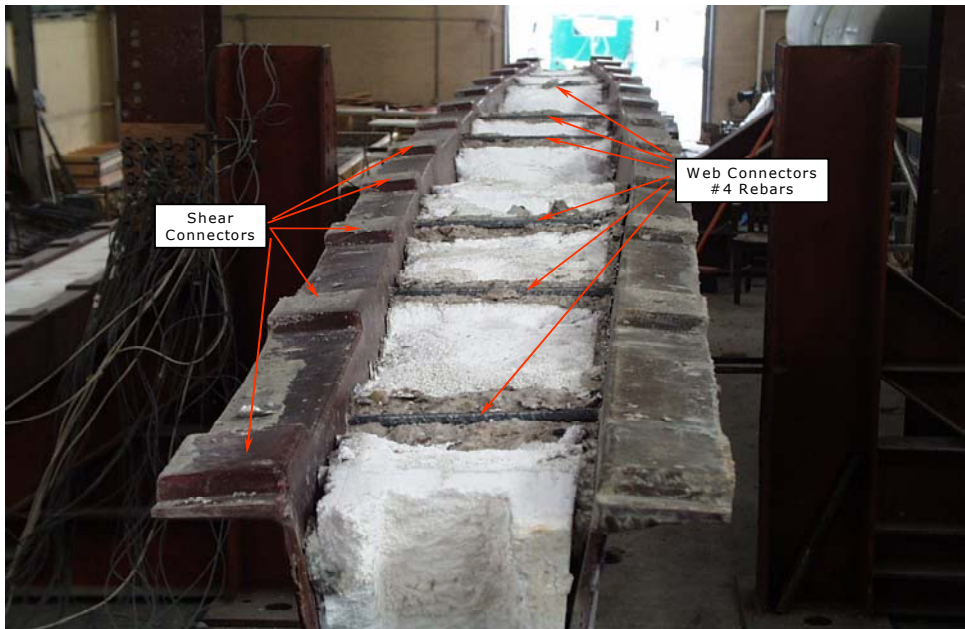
and 8.19 show the FRP girder after failure with the RC deck removed. The areas of concrete around the connectors split open. No damage was found during a follow-up visual inspection of the FRP girder. In other words the FRP girder retained its original strength.
